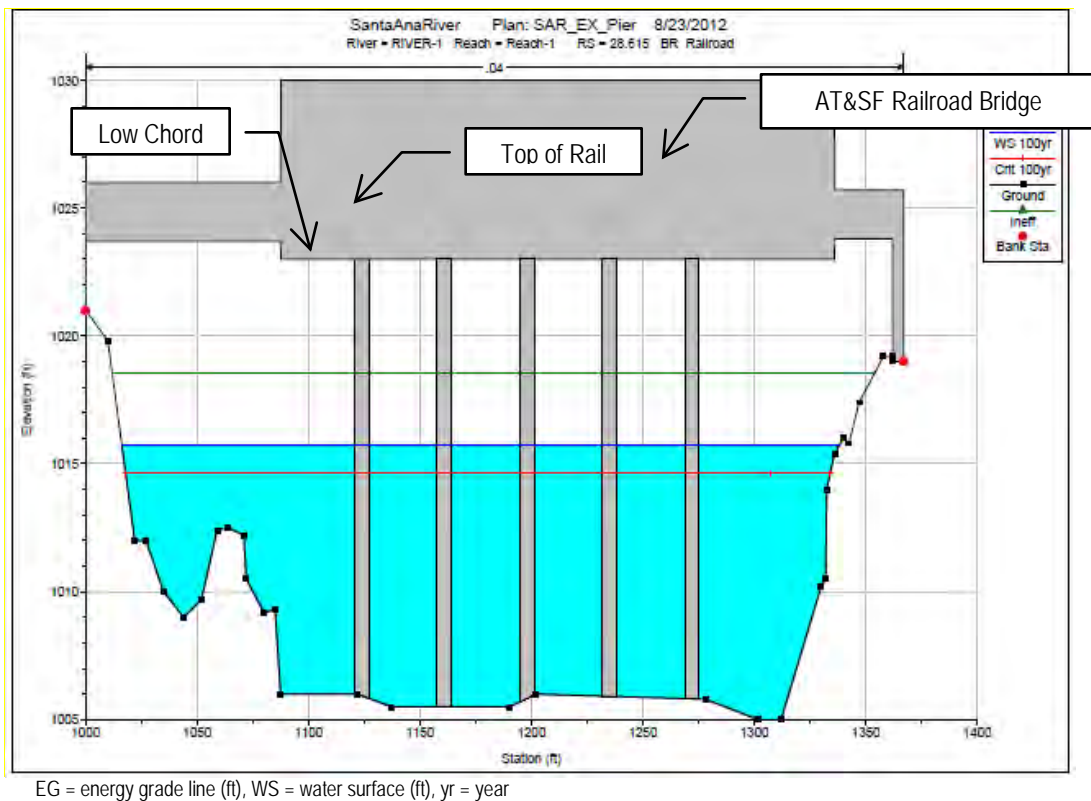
Cross-Section of Existing Conditions Upstream of Bridge 3.4
